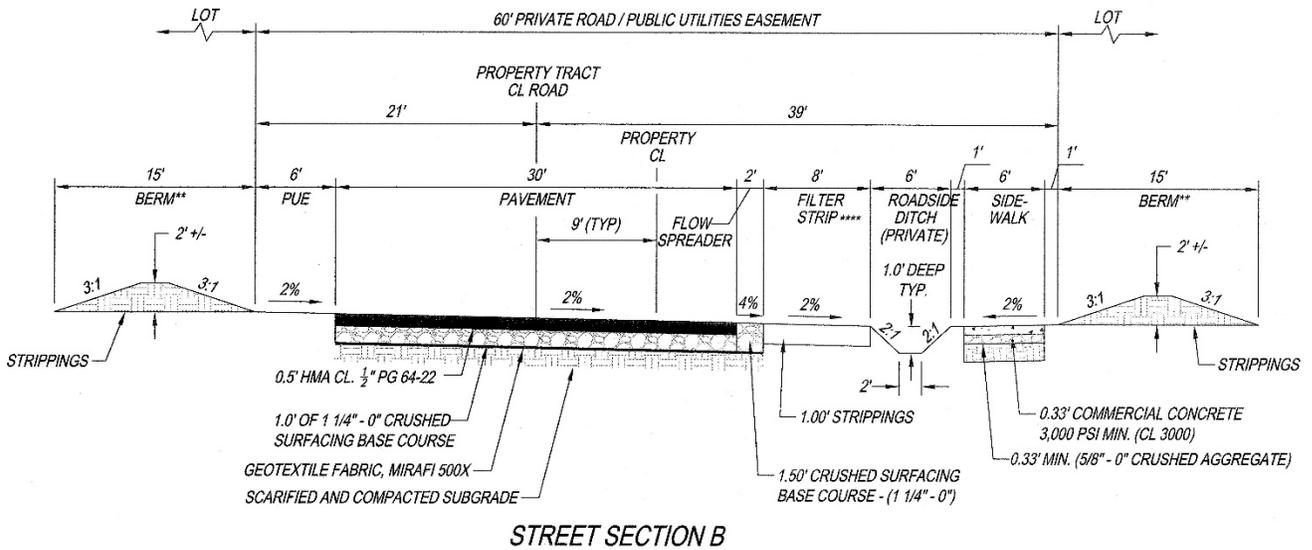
B. Street Section B: Water Quality Filter Strip with Private Road Section
